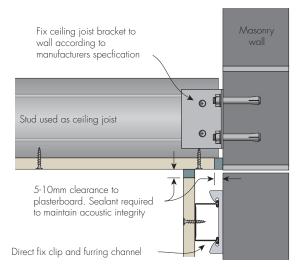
Non-Trafficable Ceiling to Masonry Wall
